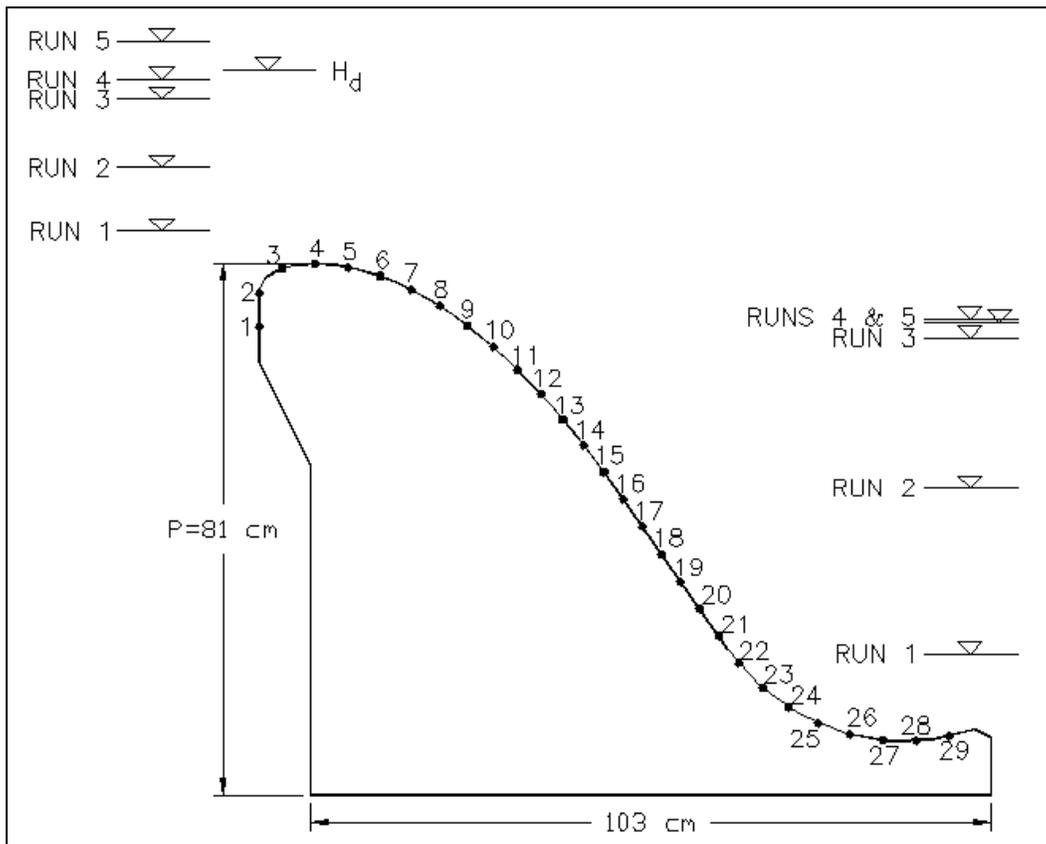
Profile of model C showing the shape, dimensions, pressure tap locations, and headwater and tailwater elevations.
